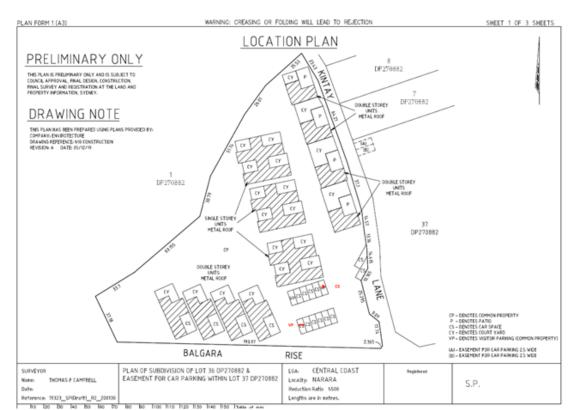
Plan of Proposed Subdivision Lot 36 DP 27082- Location Plan (Source: Survey Plan by T.F Campbell) Note: 2 car parking spaces on Part lot 37 (renumbered to Lot 49 DP 270882)
